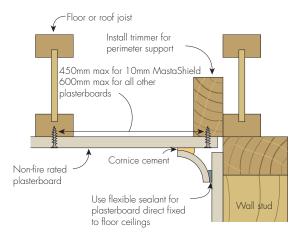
Trimmer Support For Ceiling to Wall Direct fixed to joist
